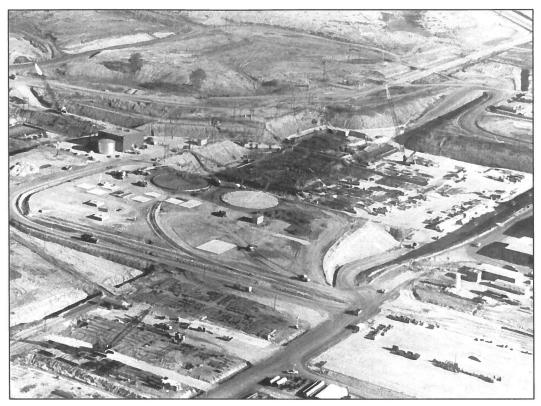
Construction Photograph of the CPS Site, 1976
